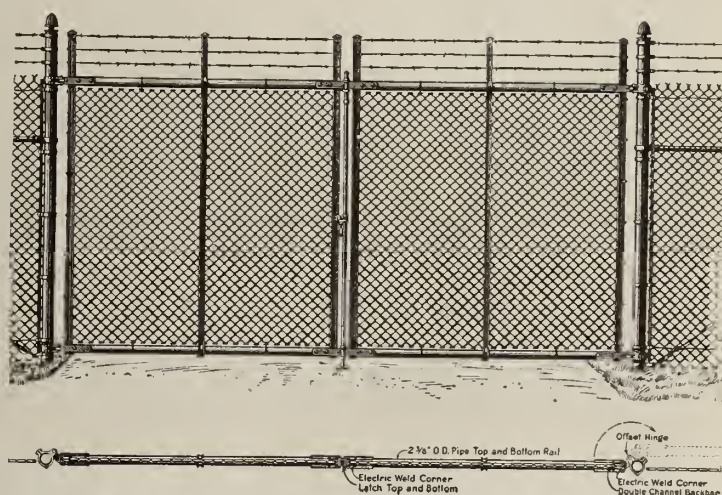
ELECTRICALLY WELDED SWINGING GATE
